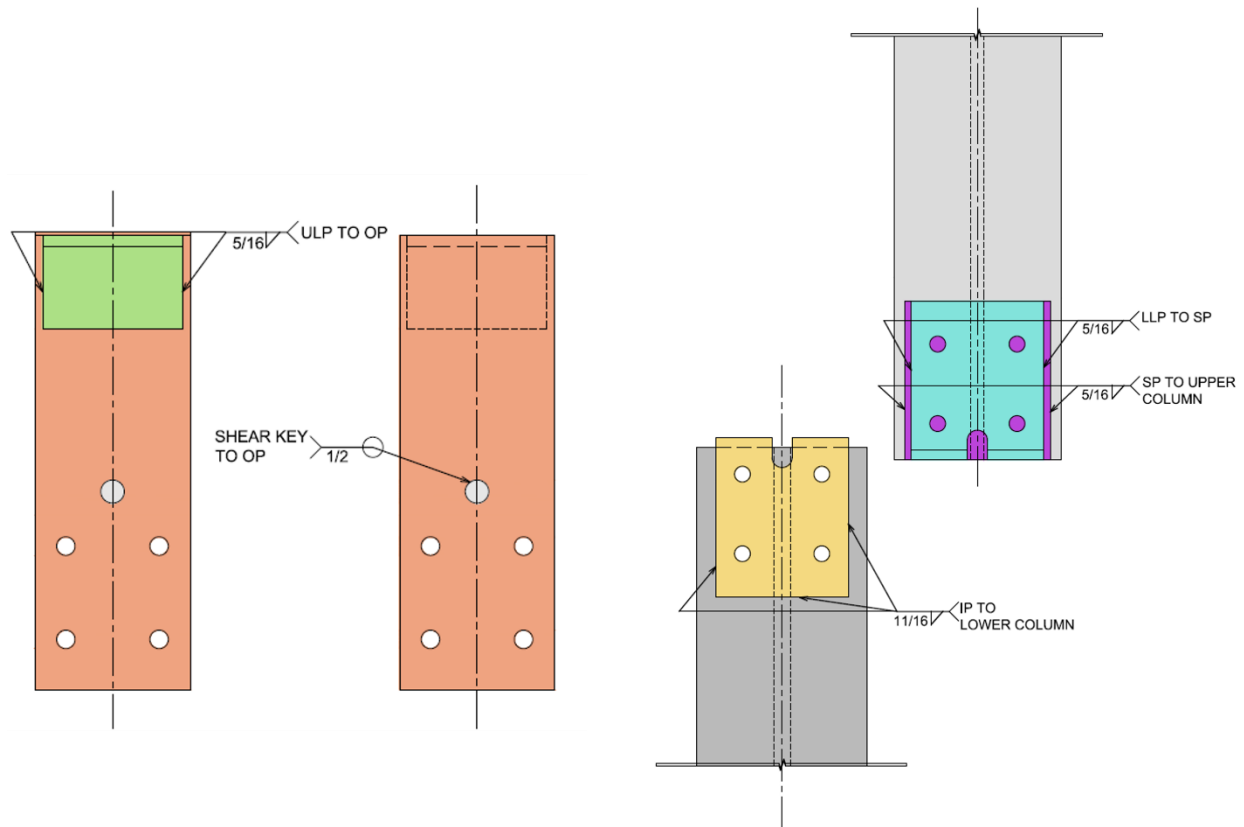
Weld locations and dimensions for the example W12x170 to W12x230 design.
